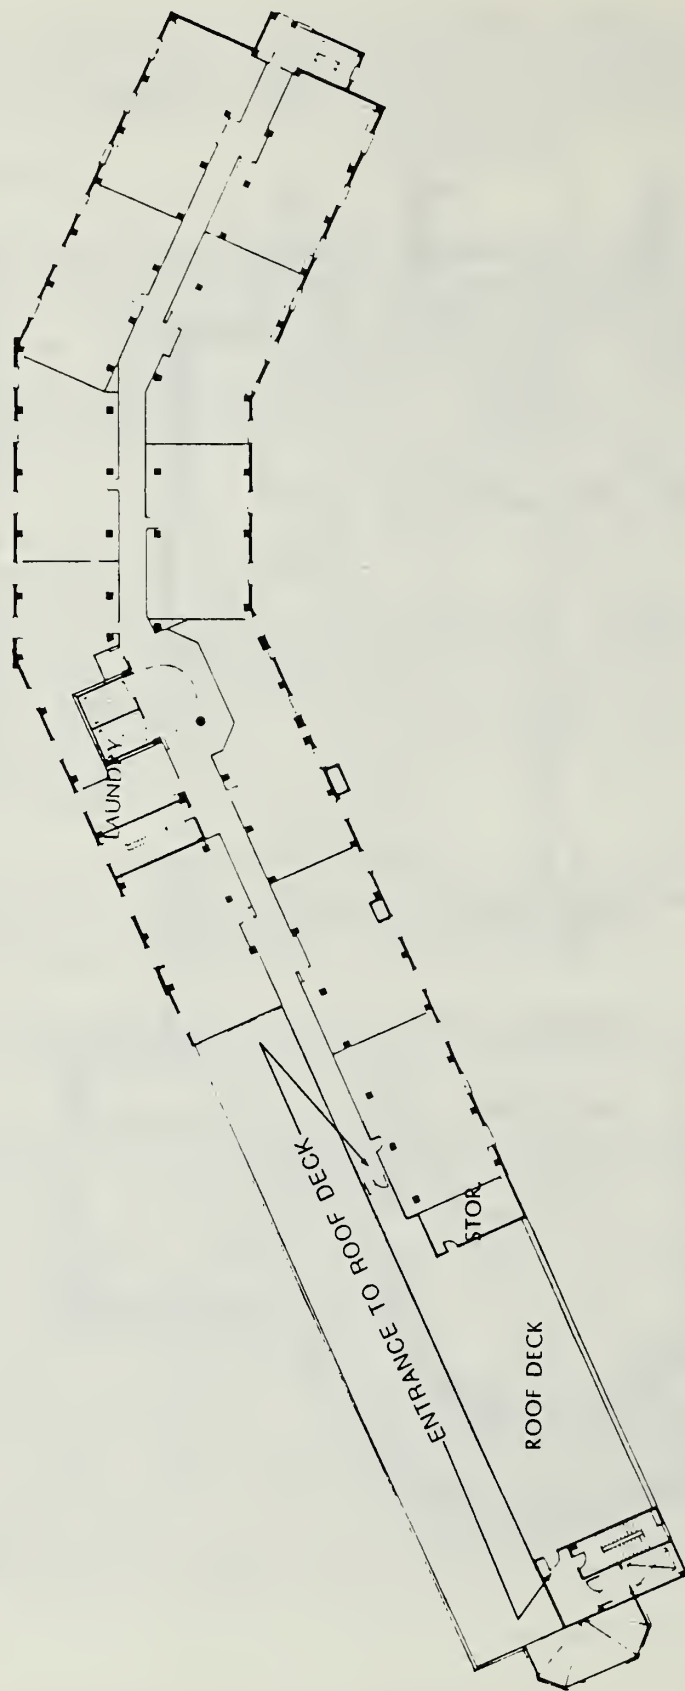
Hospital Building Floor Plan (Roof Level 6)
